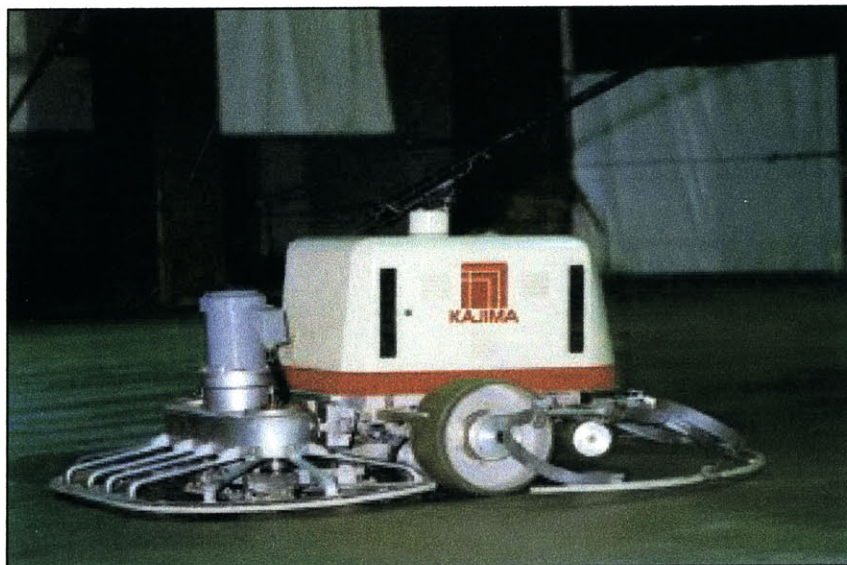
Kajima Corporation, Kote-King, Concrete Floor Finishing Robot
